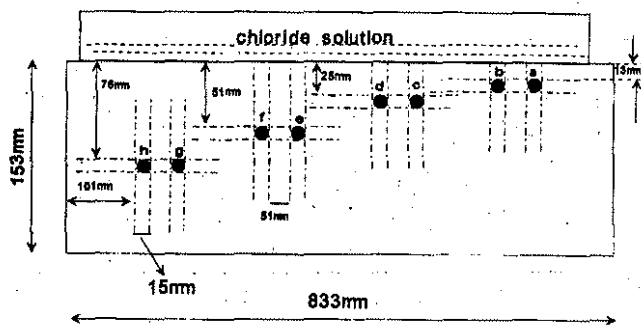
Reinforcing steel layout of reinforced concrete test slabs.
